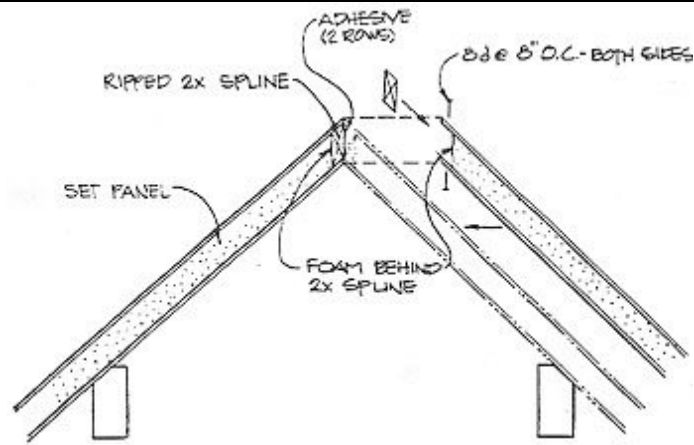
Joining Panels at Ridge Without Ridge Beam: Specially cut splines are inserted into the top edges of panels. Once these splines have been installed, the panels are joined with adhesive and 16d nails, angled through the OSB and into the splines.
